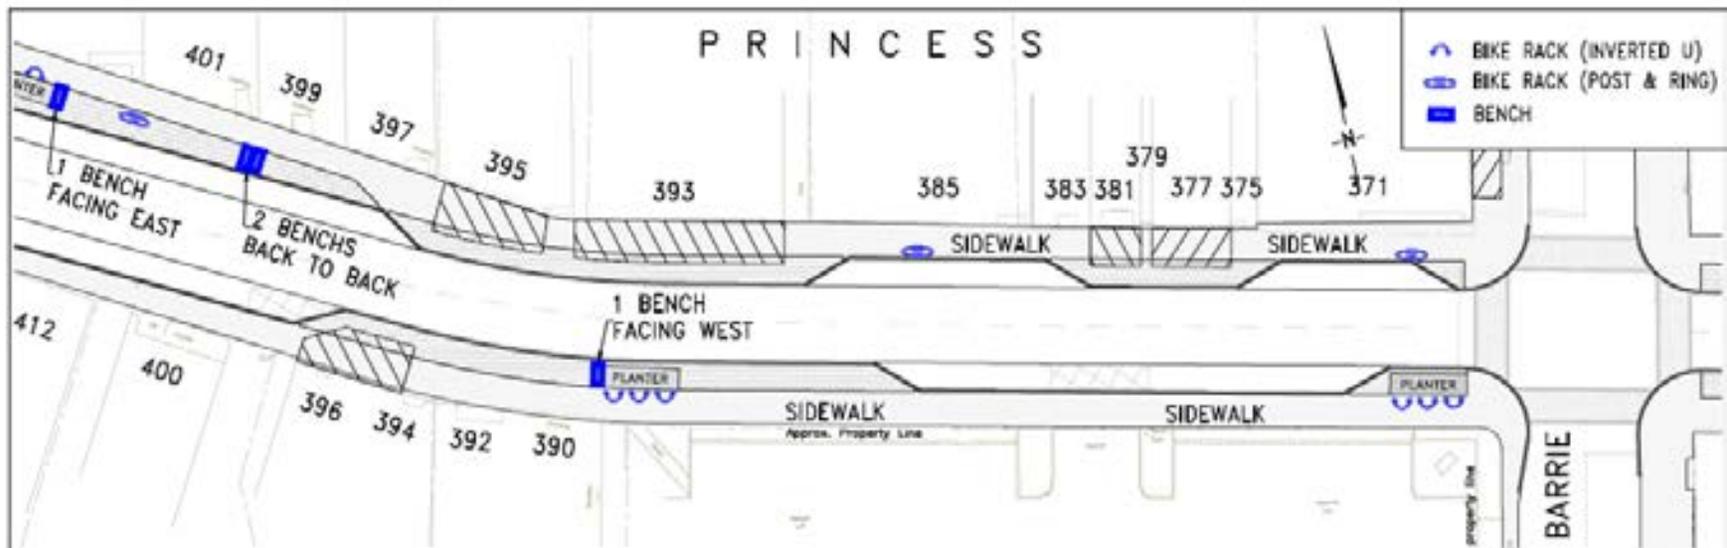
Bench and Bicycle Rack Placement from 412 Princess Street east to Barrie Street
